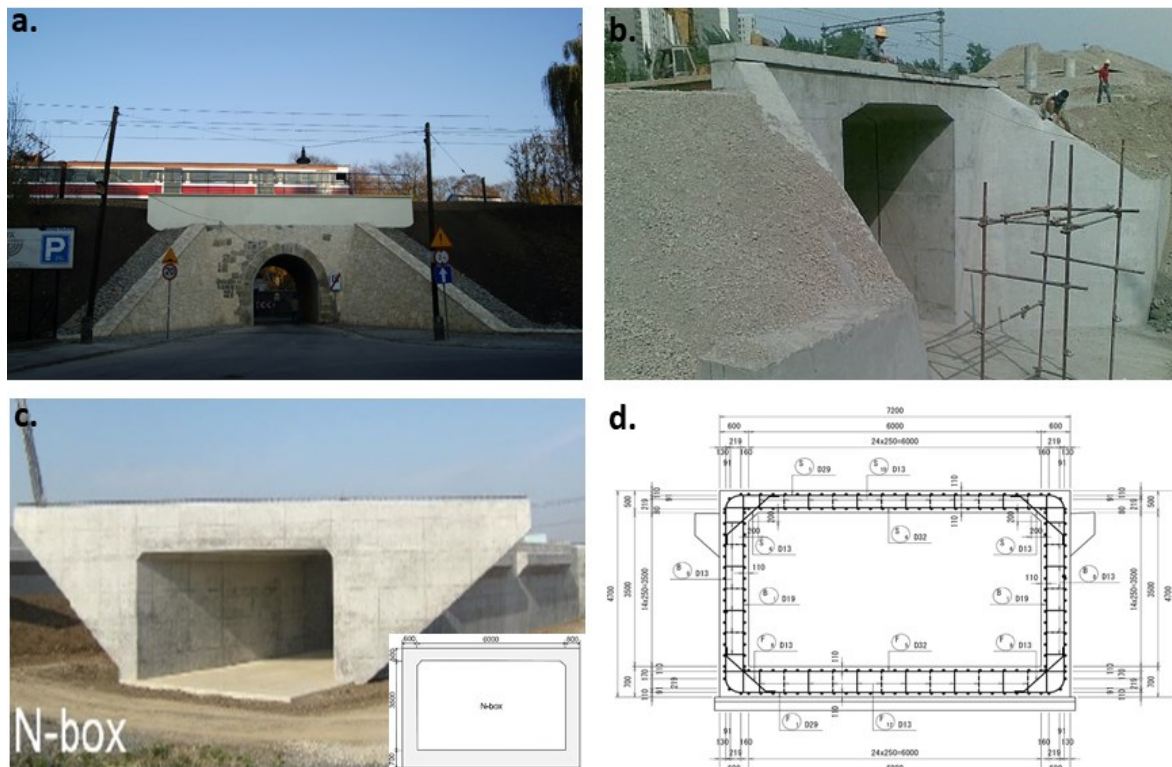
a). A traditional railway culvert (stone arch), Miodowa street, Kazimierz, Krakow, Poland [359]; b). Construction of a concrete box culvert under railway [360]; c). A precast reinforced concrete box culvert [337]; d). Detailed reinforcement drawing of culvert in Figure 3.1c [337].
